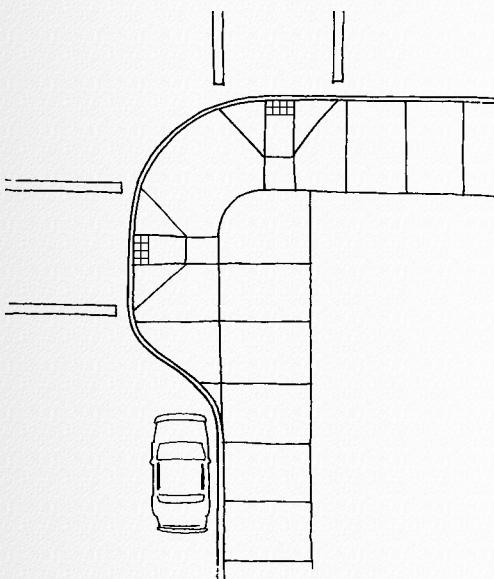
Curb extensions improve pedestrian visibility and provide additional space for level landings at curb ramps.
